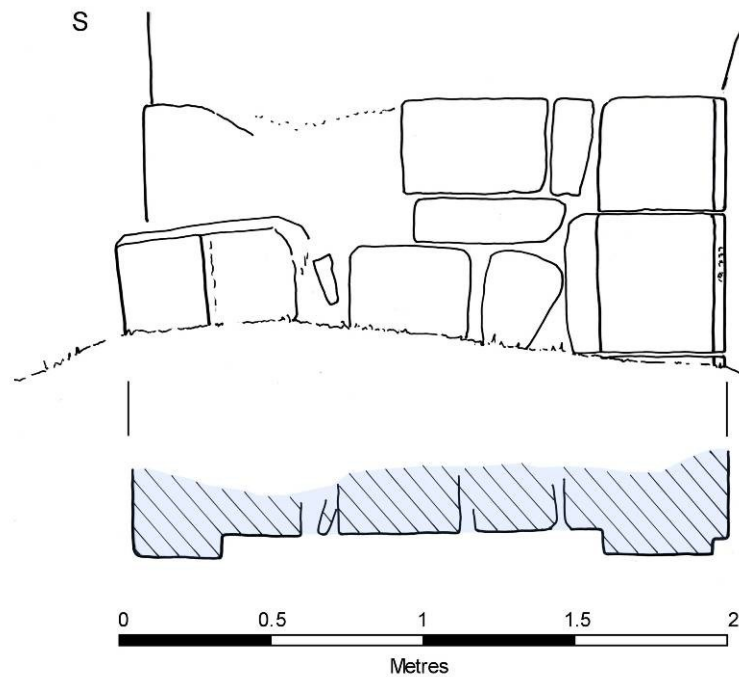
East-facing elevation and horizontal section of the surviving west jambs of the entrance lobby (1:25)
